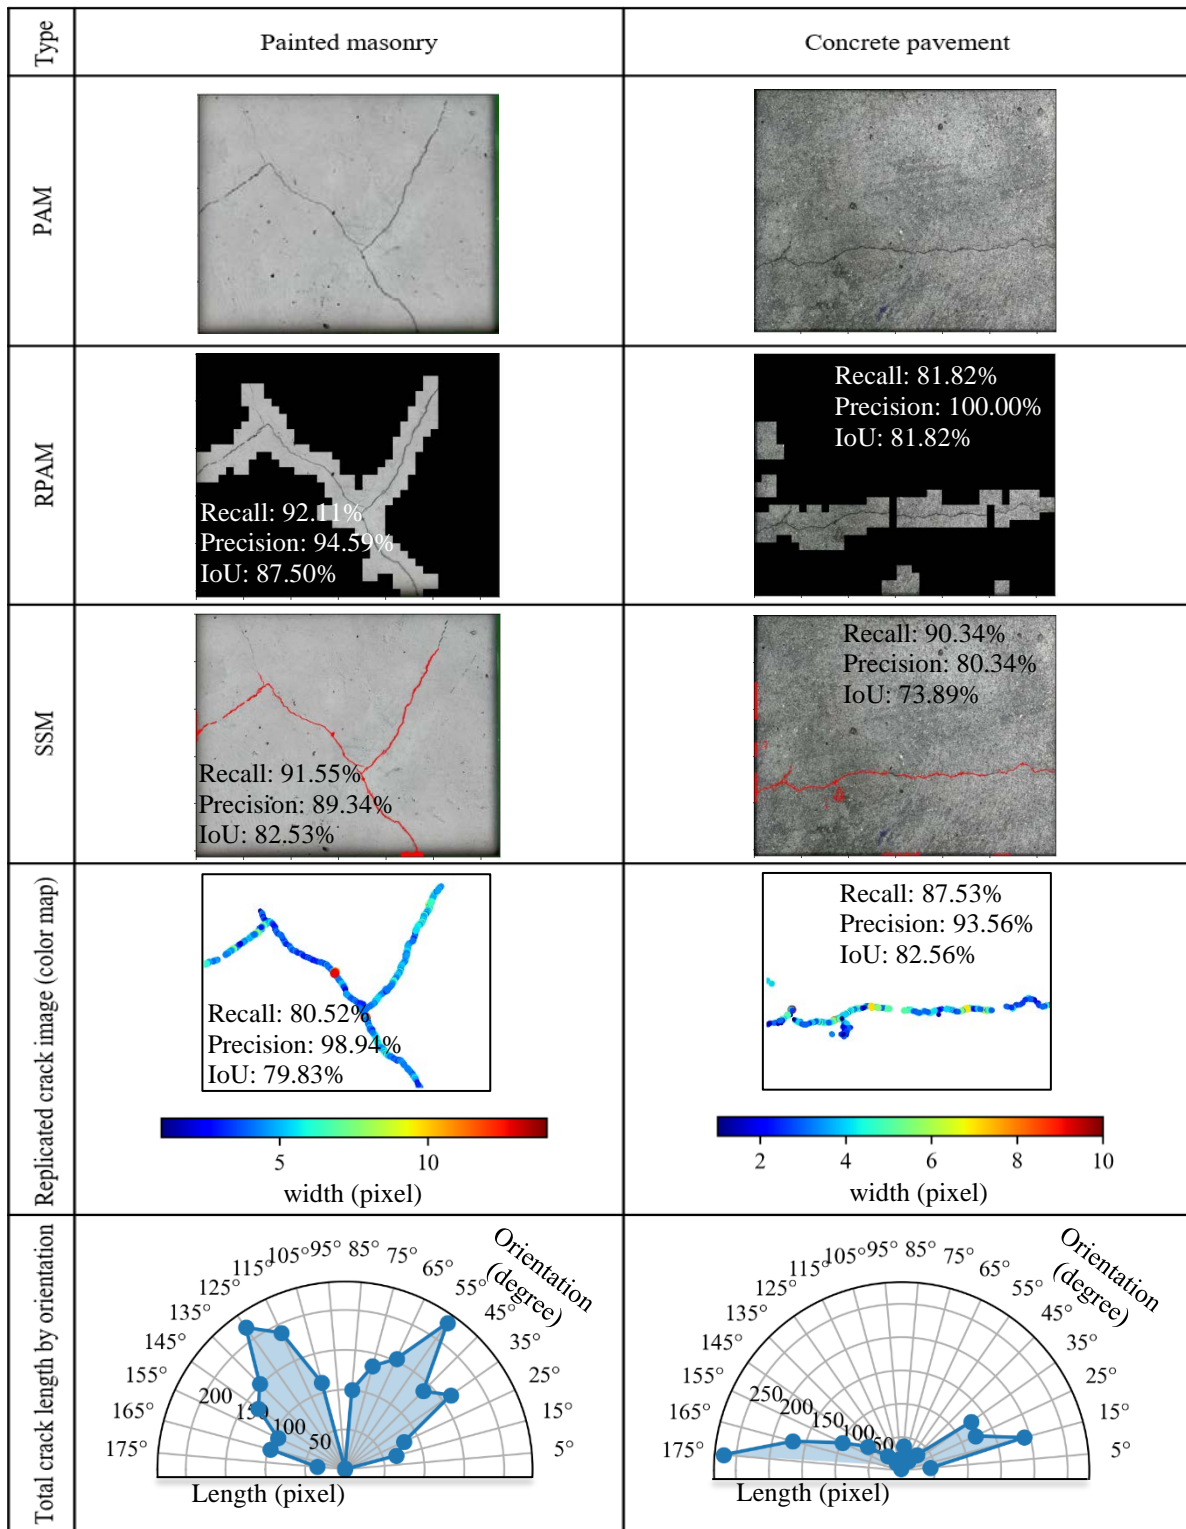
shows examples of measurement of cracks on (1) painted masonry, and (2) concrete pavement.
